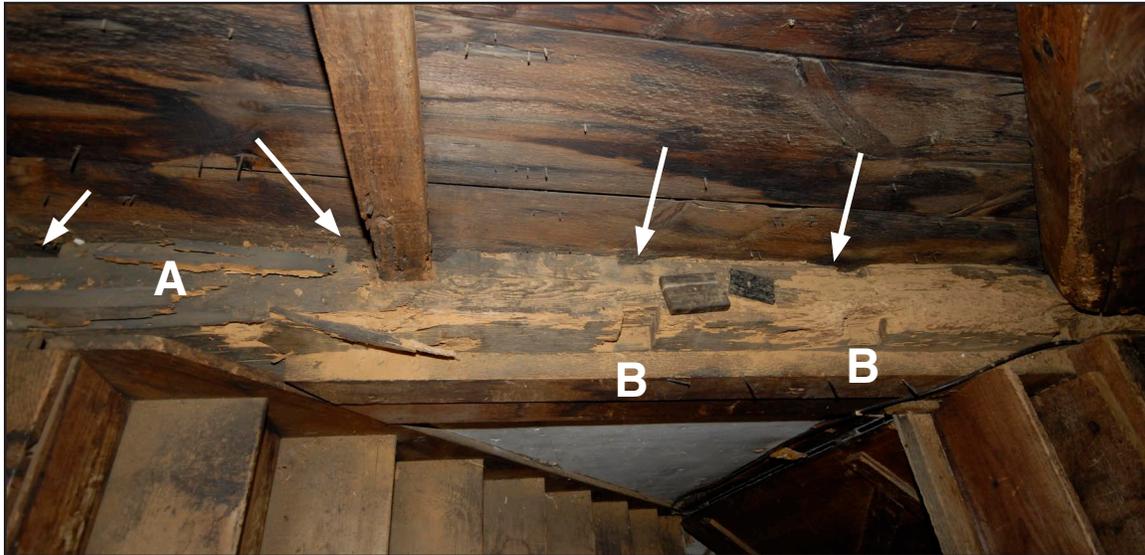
East end attic tie beam (A) that would have been the east chimney tie beam if the original house had a two room center chimney plan. The unused open mortises (arrows) on the far side of the beam are evidence that the house may have originally been of two room center chimney plan, as they would have housed the floor joists of the attic over the original east chamber. The two empty mortises on the near side (B) would have been for ceiling joists over the stairhall before the current attic stair was installed. The wall studs are nailed at their tops to the rafters with 18th century wrought nails, while they are housed in the tie beam in open gains rather than in mortises set back an 1 1/2" from the face of the beam as is normal in original construction. Gains are used when a stud is added later. This evidence suggests the sheathing on the east wall was added in the later 18th century well before the c. 1840s alterations. If the house was divided between family generations, perhaps the partition was installed to divide the attic.
